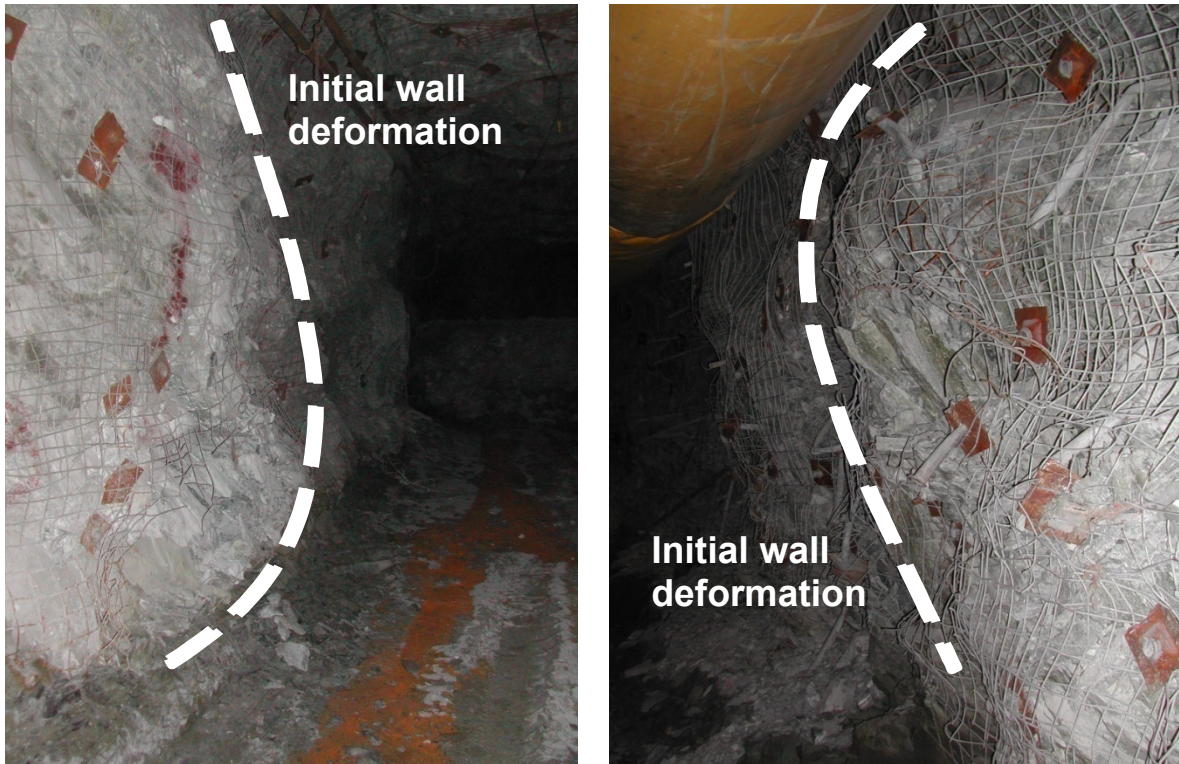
Footwall (left) and hanging wall (right) of drift 227-43-E (LaRonde mine, March 2008)
